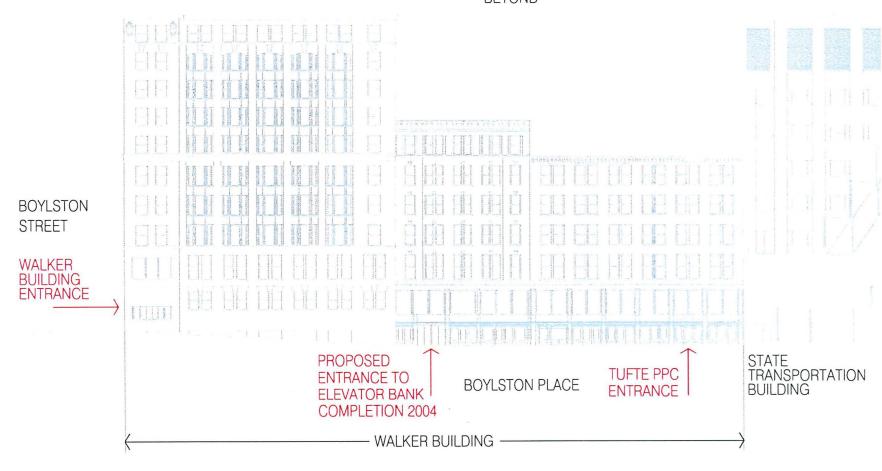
Walker Building and Tufte PPC Access Locations (1 of 2)
